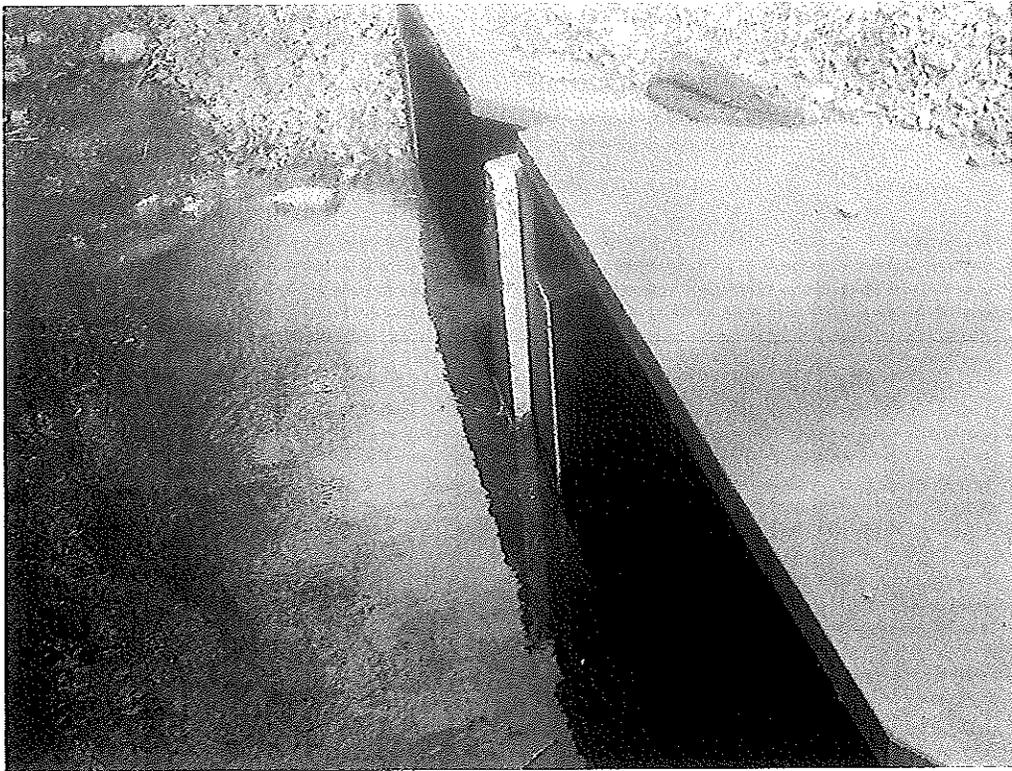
Down Stream End Of Twin Rectangular Culverts (North West CSX ROW)
